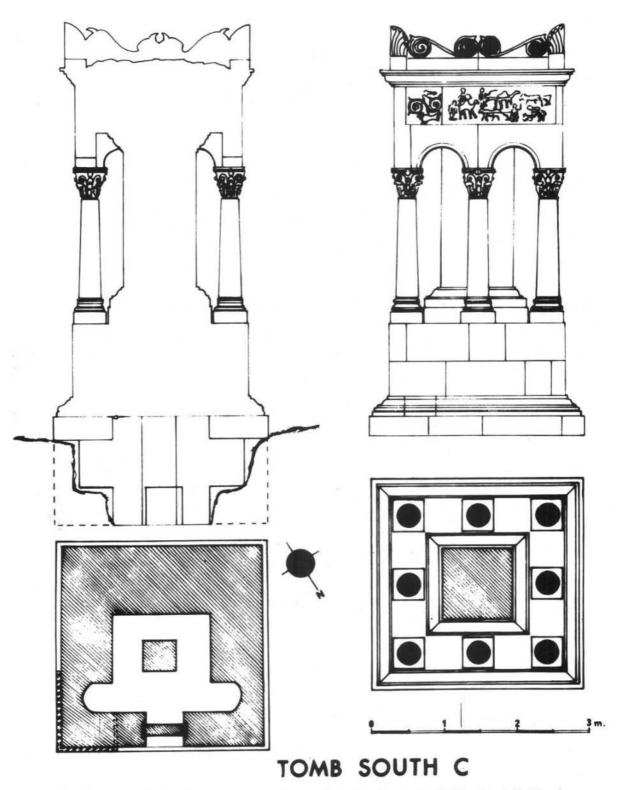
Tomb South C: east elevation, plans, and section. Drawn by R. Tood and N. Wood.
